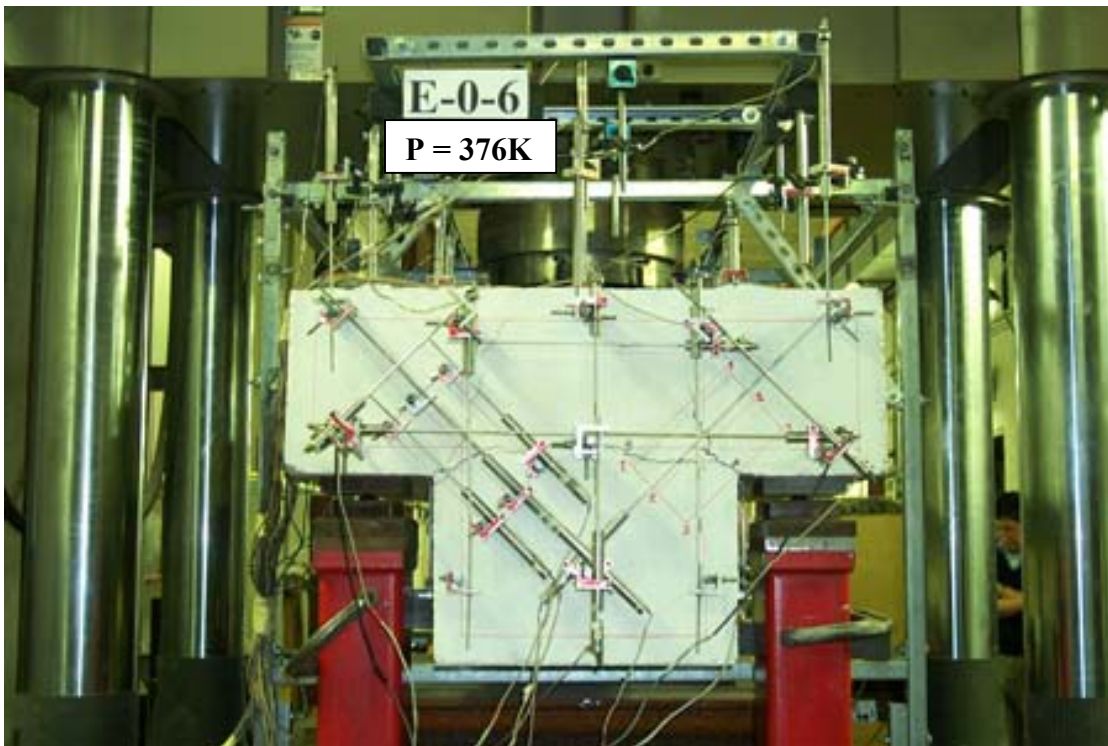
(b) Horizontal and diagonal cracks in Specimen E-0-6
